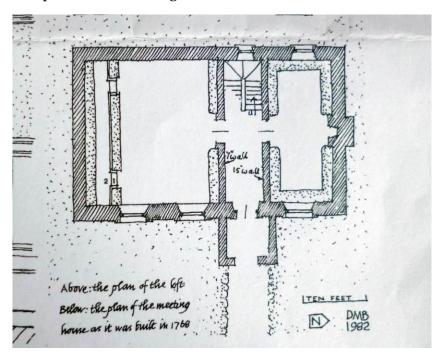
reconstructed ground plan from Butler, Vol 2, p778
